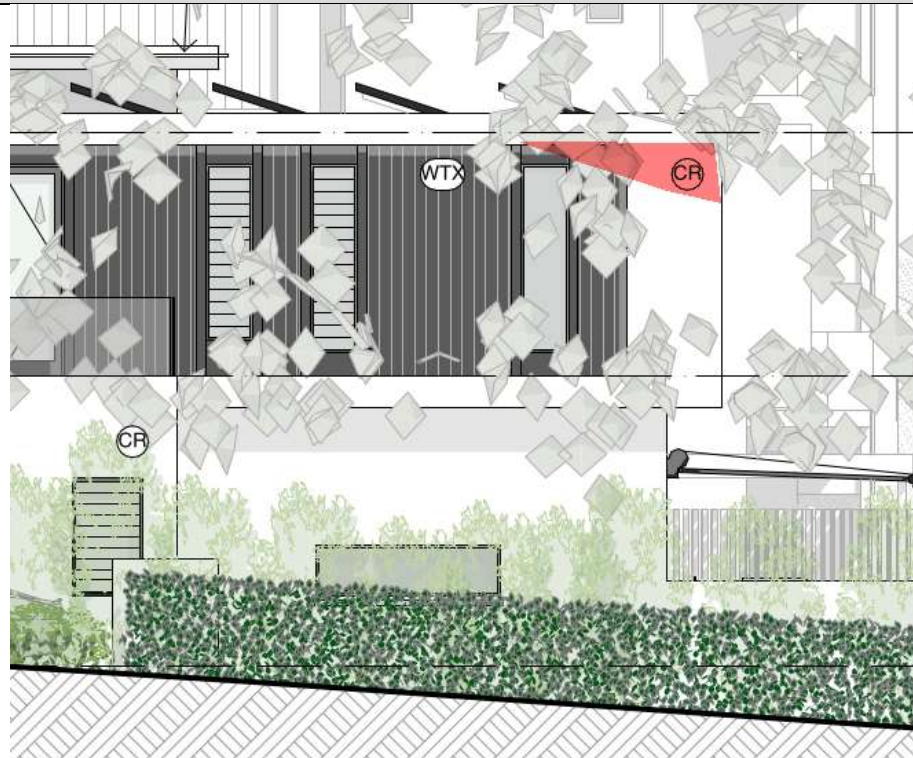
Building envelope breach as shown on dwg. 120a Eastern Elevation
